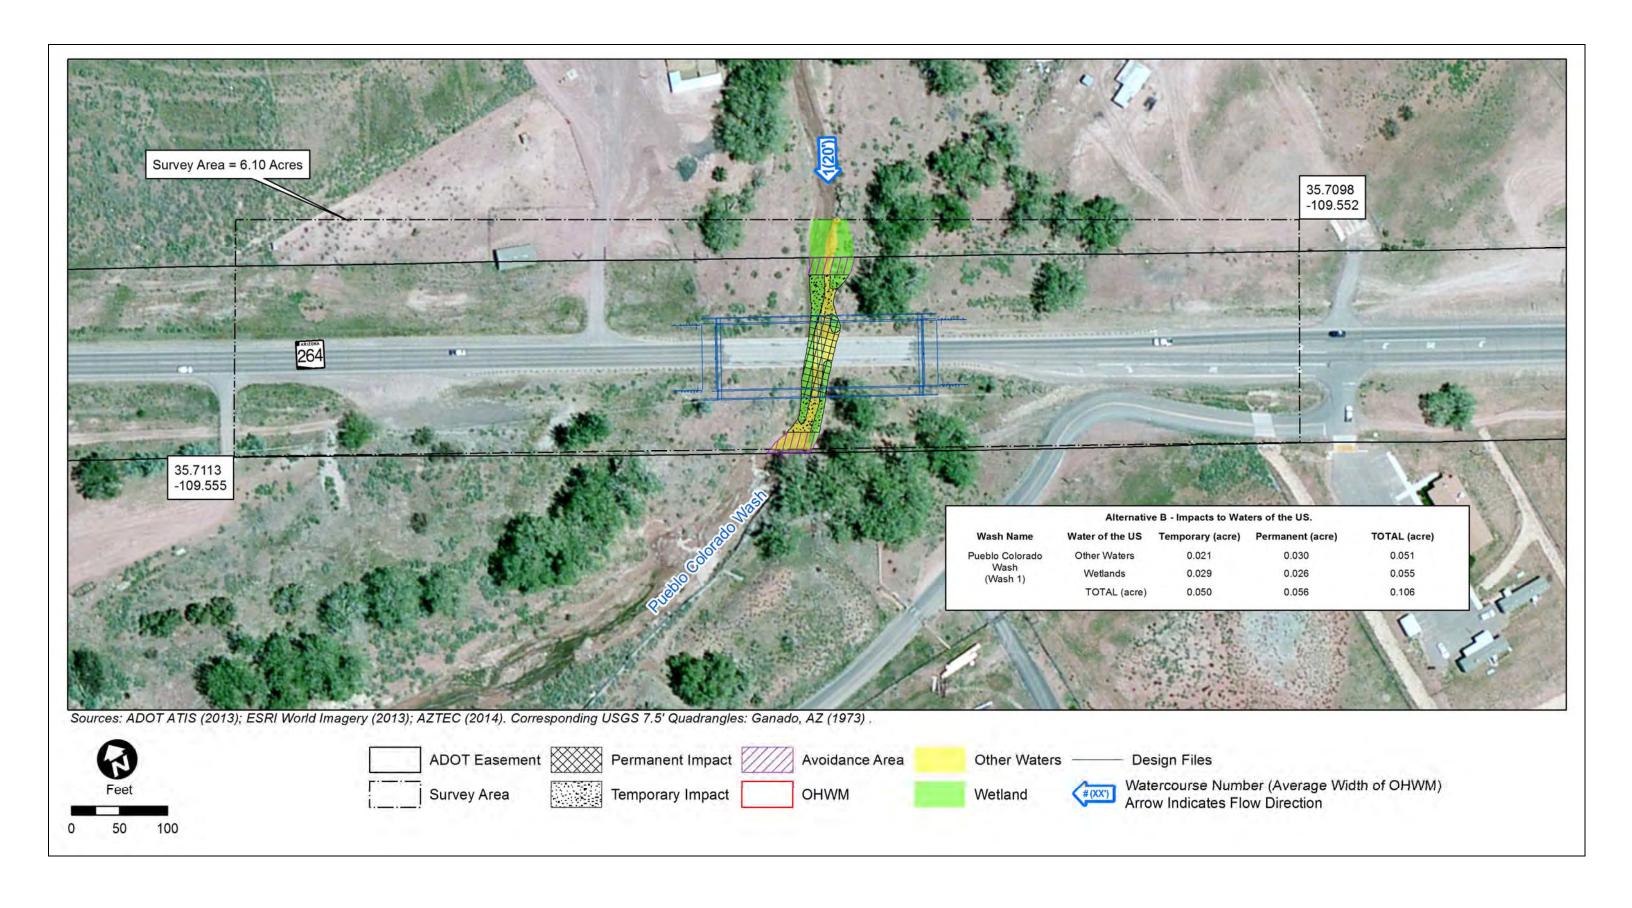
Impacts to Waters of the US for Ganado Wash Bridge, Alternative B – 2-span Steel Structure
